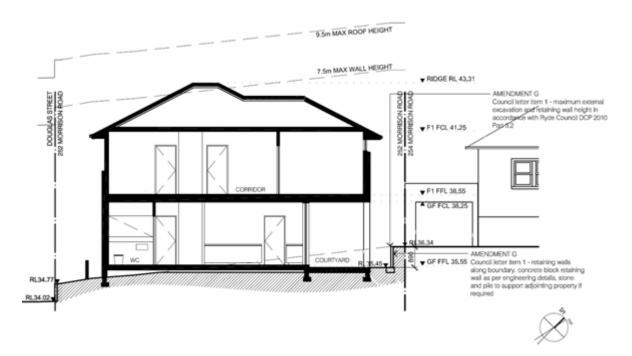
Cross-section of the proposed development showing amount of cut at the boundary.
